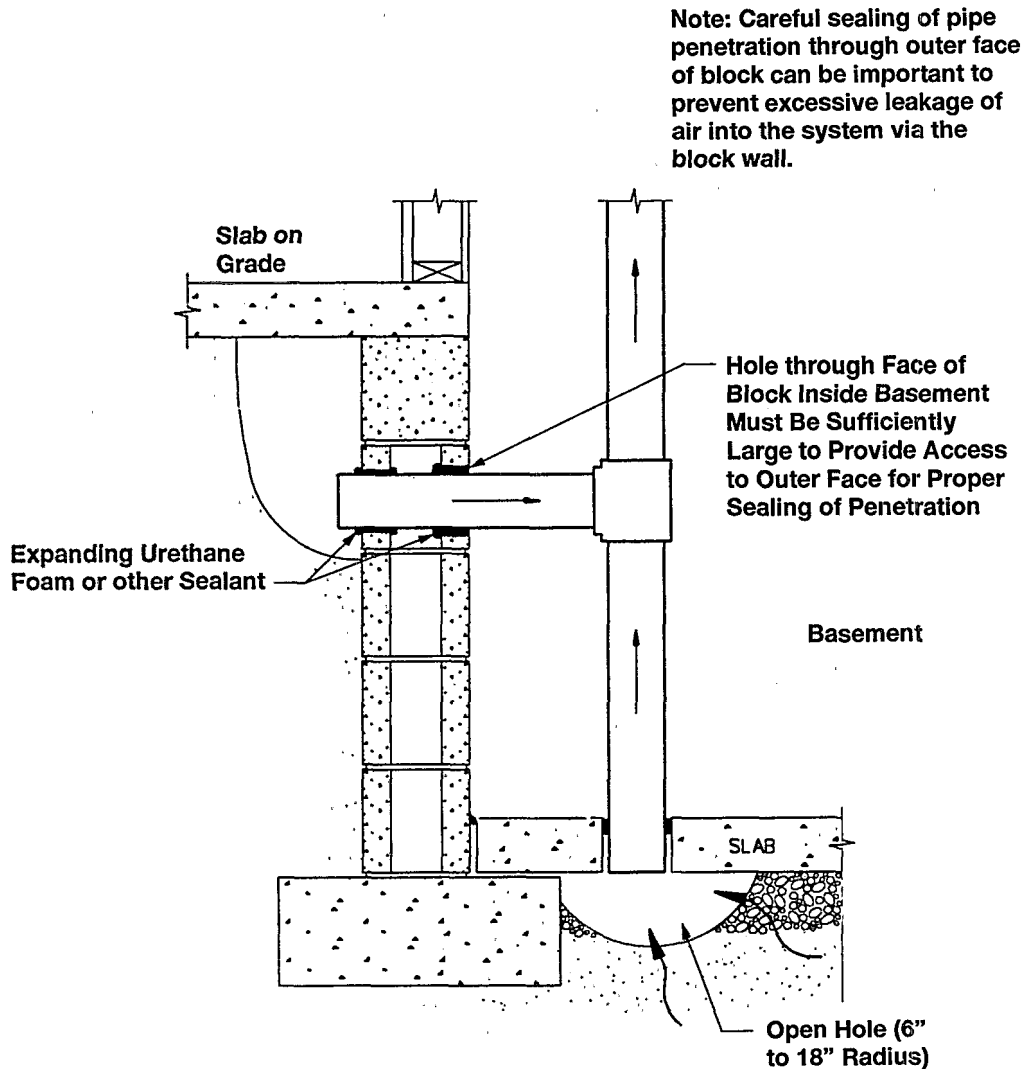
A typical configuration for treating an adjoining slab on grade using a horizontal suction pipe penetrating the stem wall from inside the basement.
